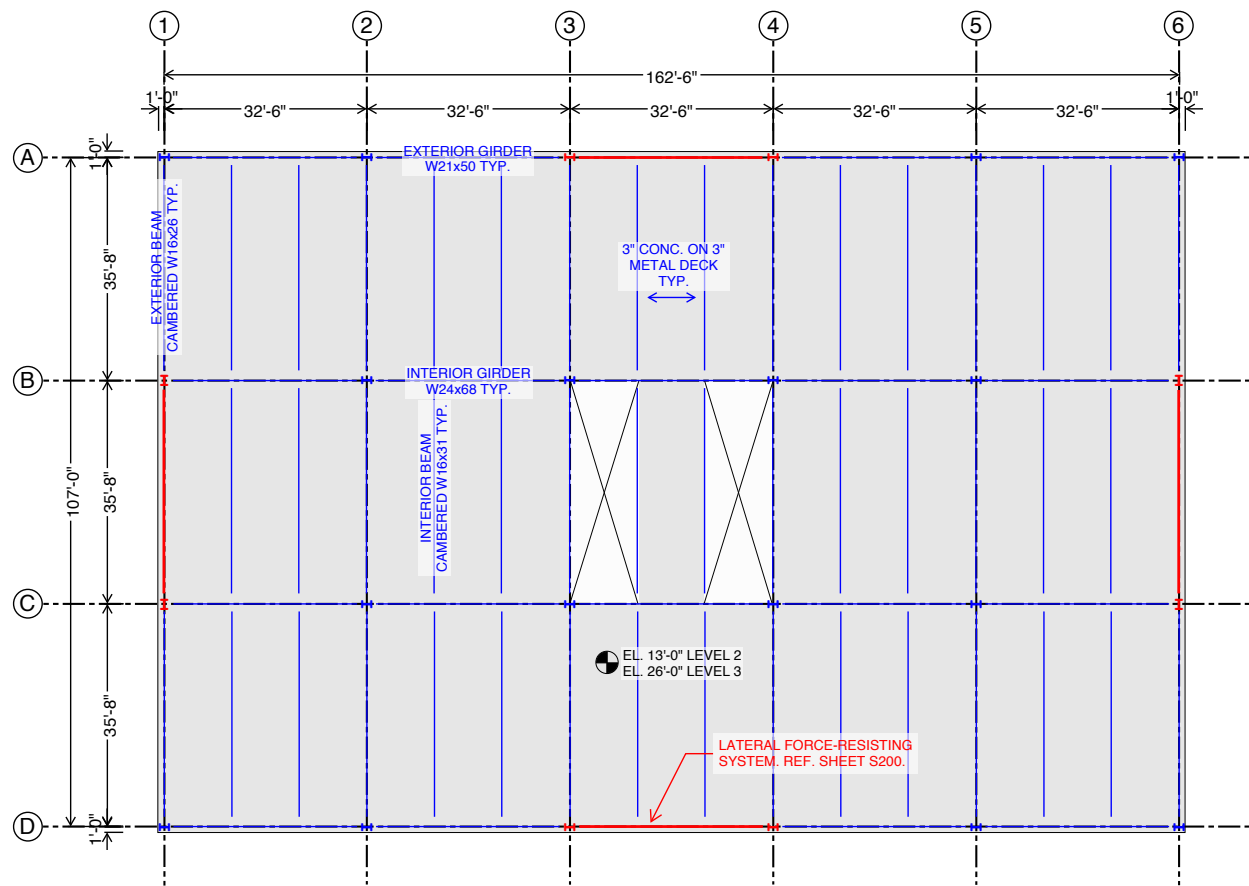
Typical floor plan for the medium structural steel office building
